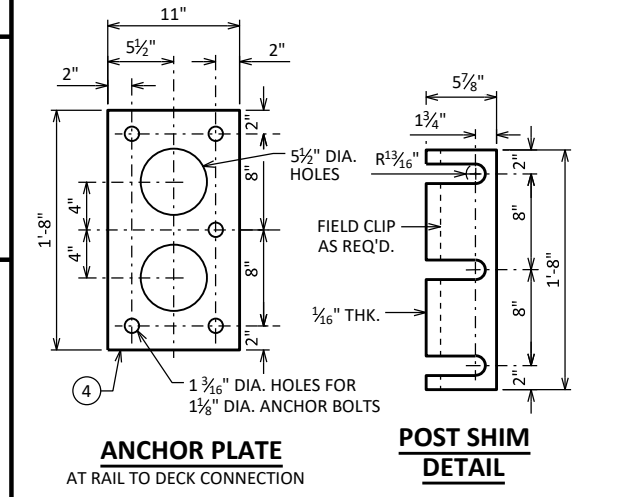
DETAIL AT END POST THRIE BEAM RAIL ATTACHMENT
